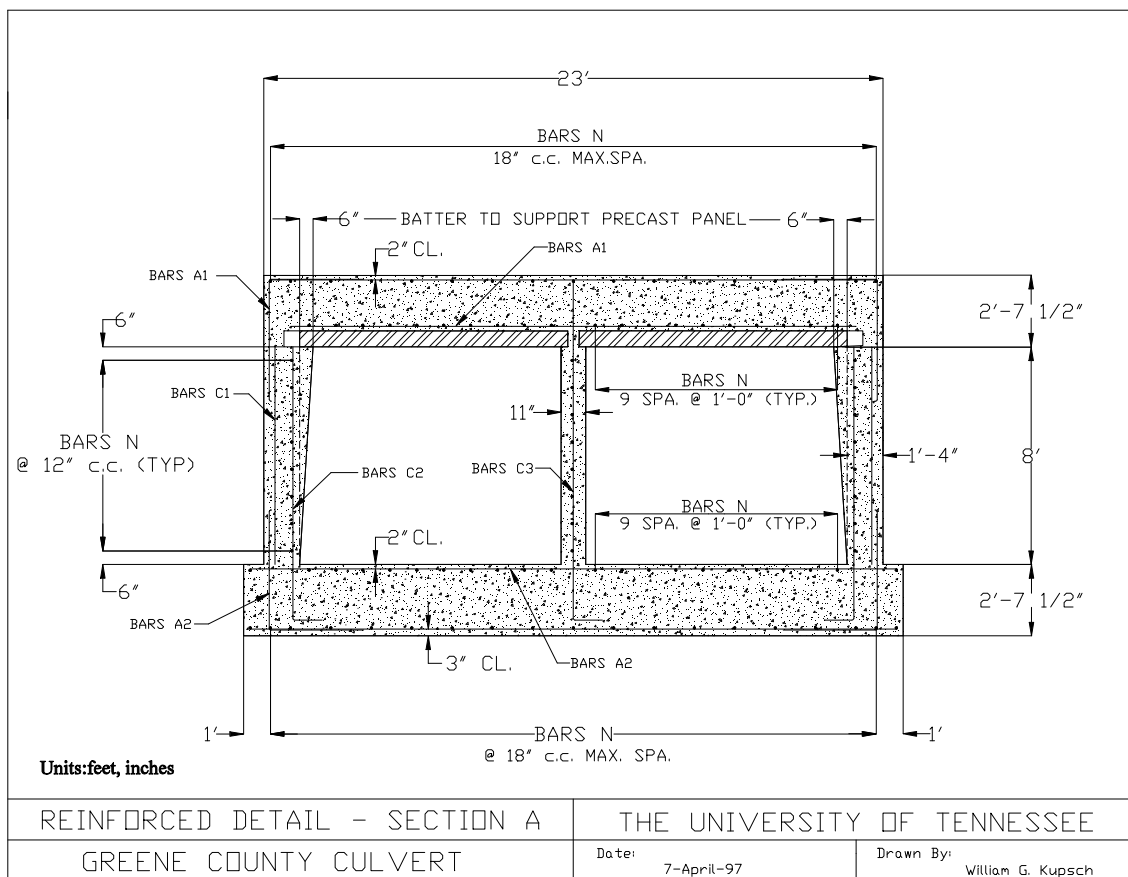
Reinforced Detail of Culvert in Greene County, TN
